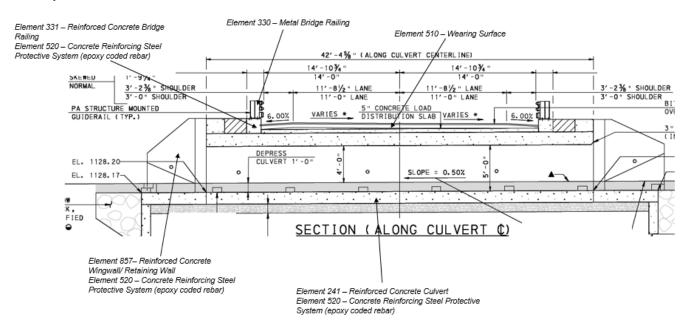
Typical Section Along Centerline of the Culvert
